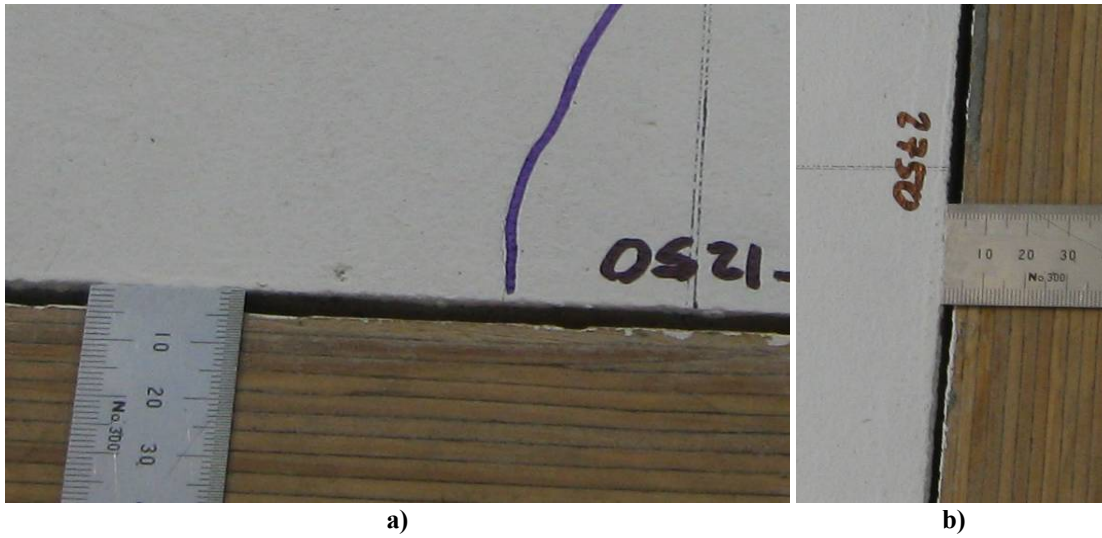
Gap opening between slab and beam 2.0% Drift: a) NE bay b) NW bay
